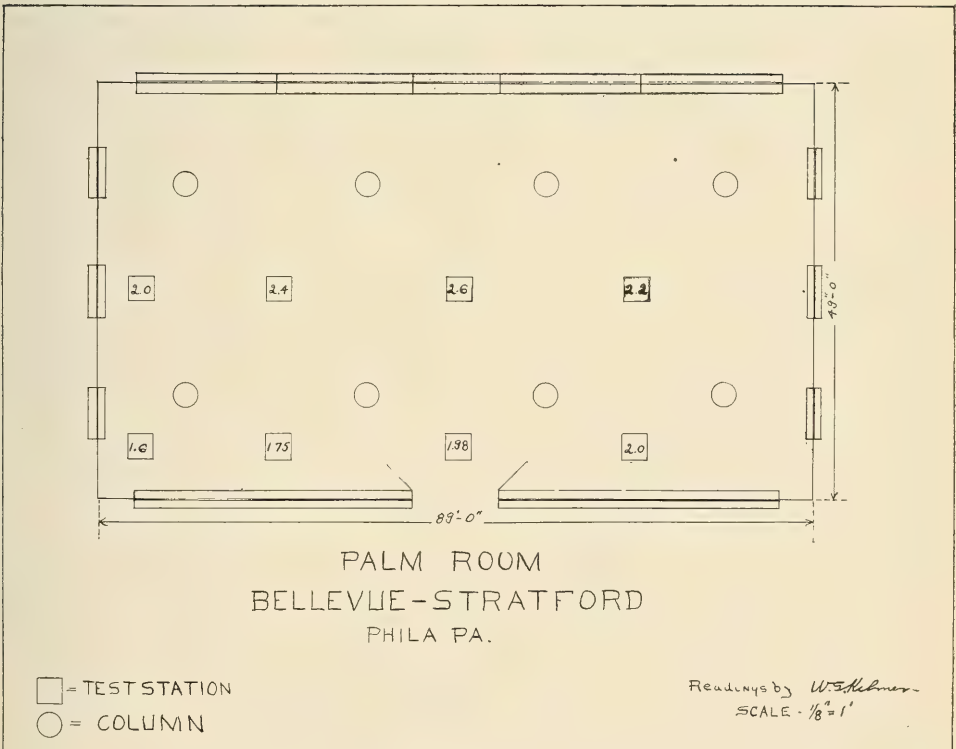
FIG. I.—FLOOR PLAN OF TEST STATIONS.
